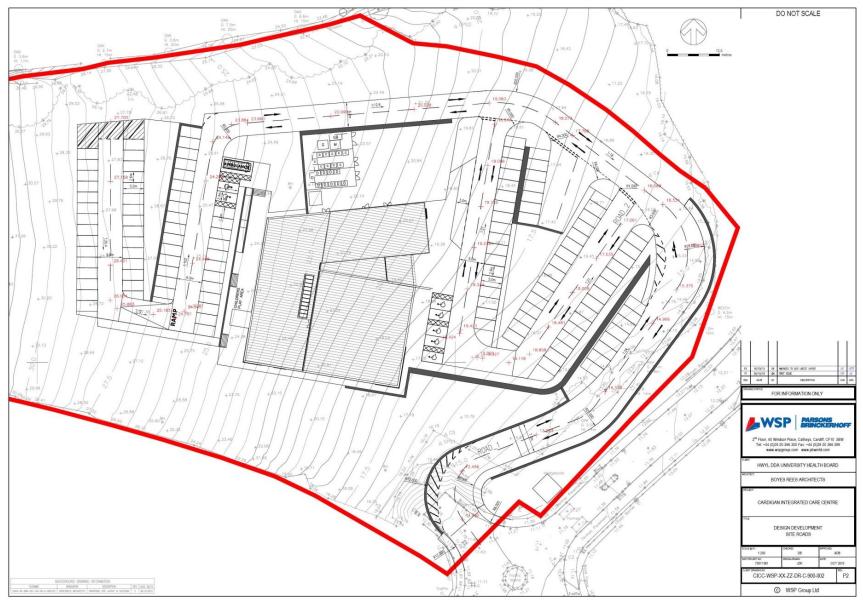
Proposed layout plan of Cardigan Healthcare Centre as supplied by client.
